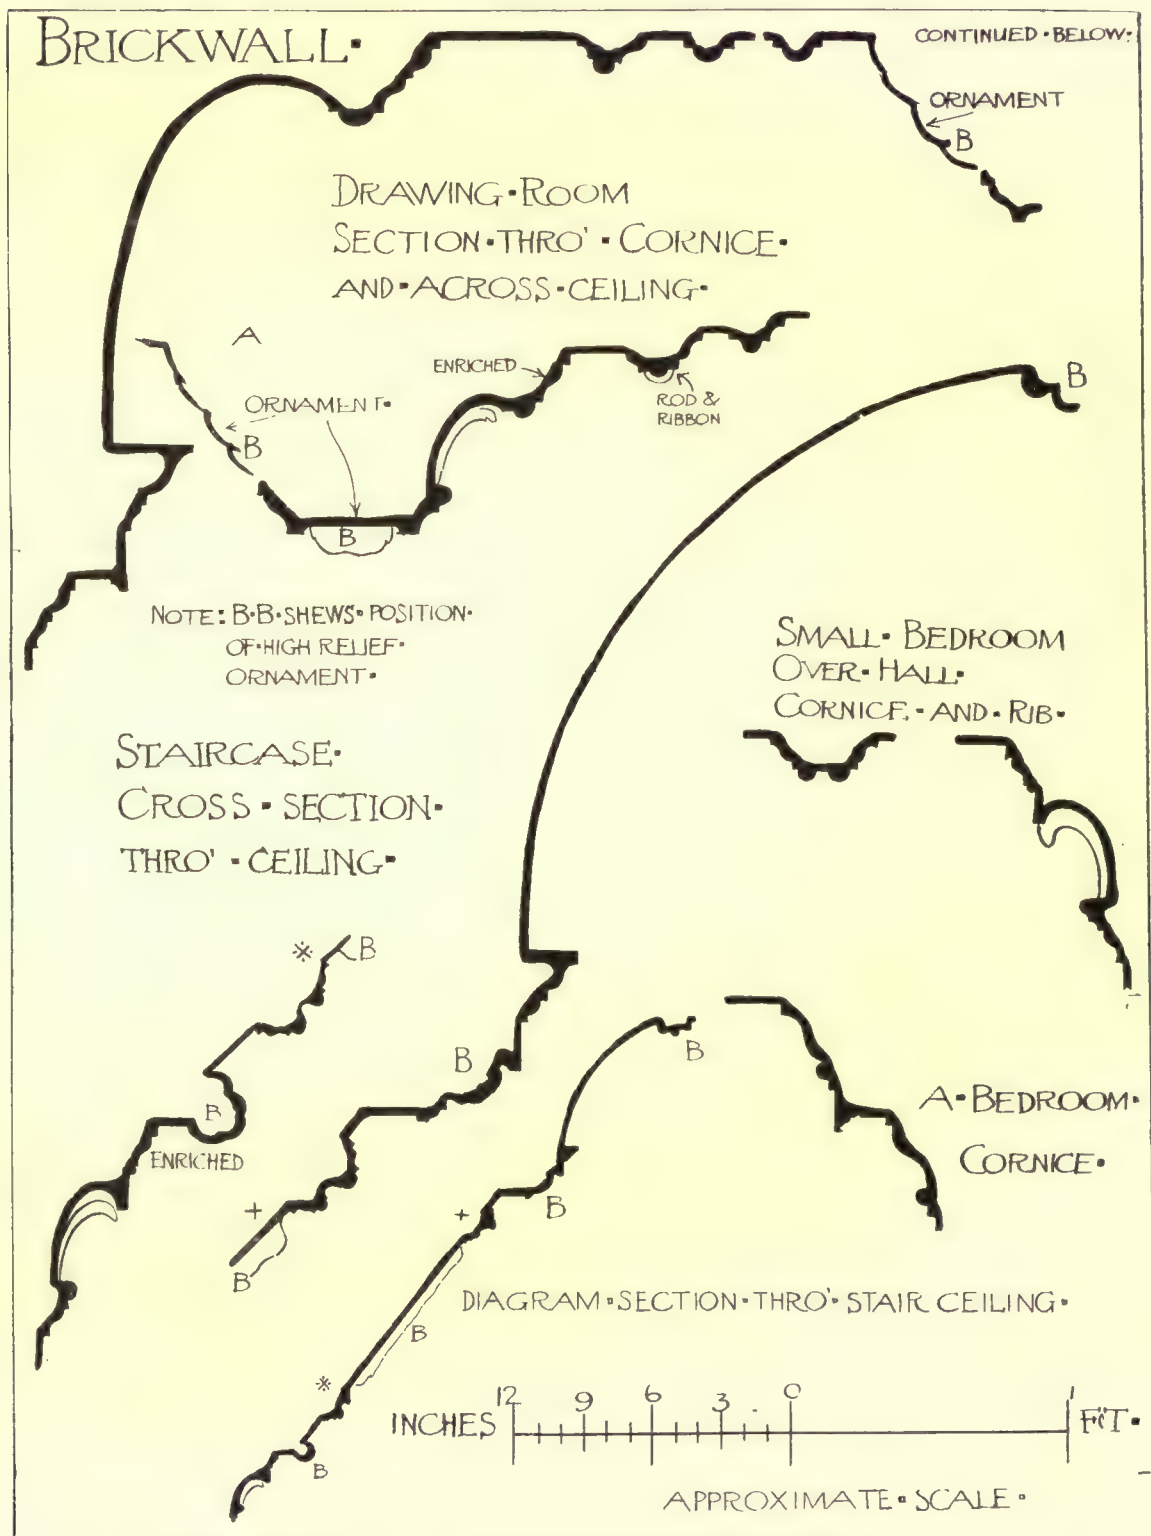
MOULDINGS FROM BRICKWALL, NORTHIAM, SUSSEX.
